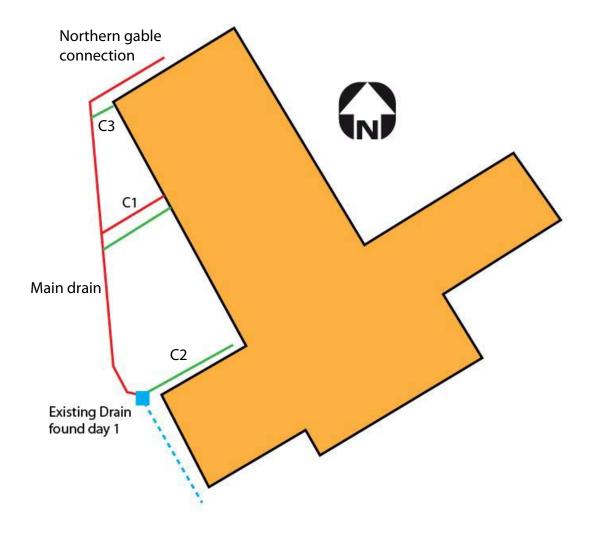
Location sketch of drainage trenches at Bodidris Hall, Llandegla.
